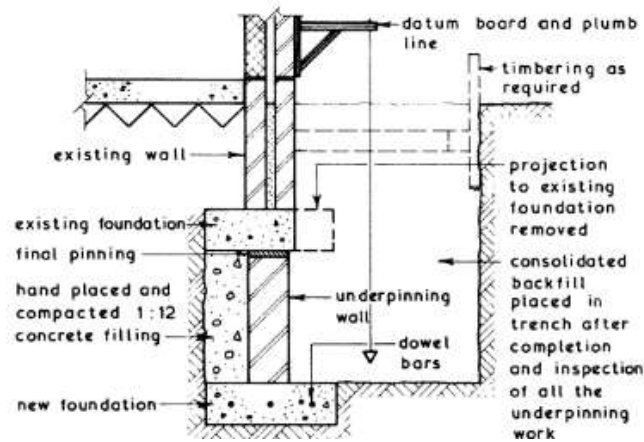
Traditional wall bearing underpinning (Chudley & Greeno, 2008)
